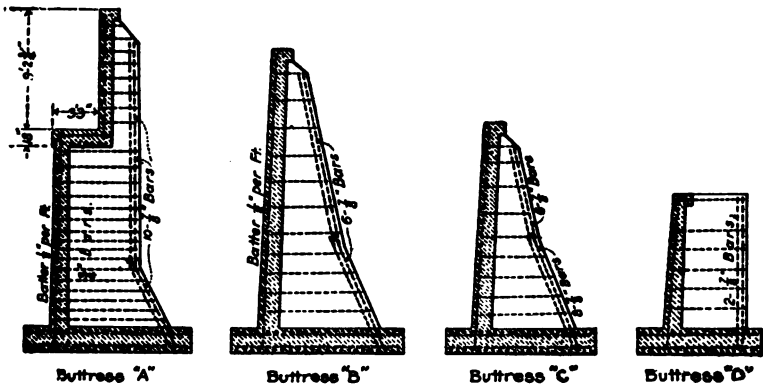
Sections of 25-Ft. Abutment, K. C., M. & O. Ry.
